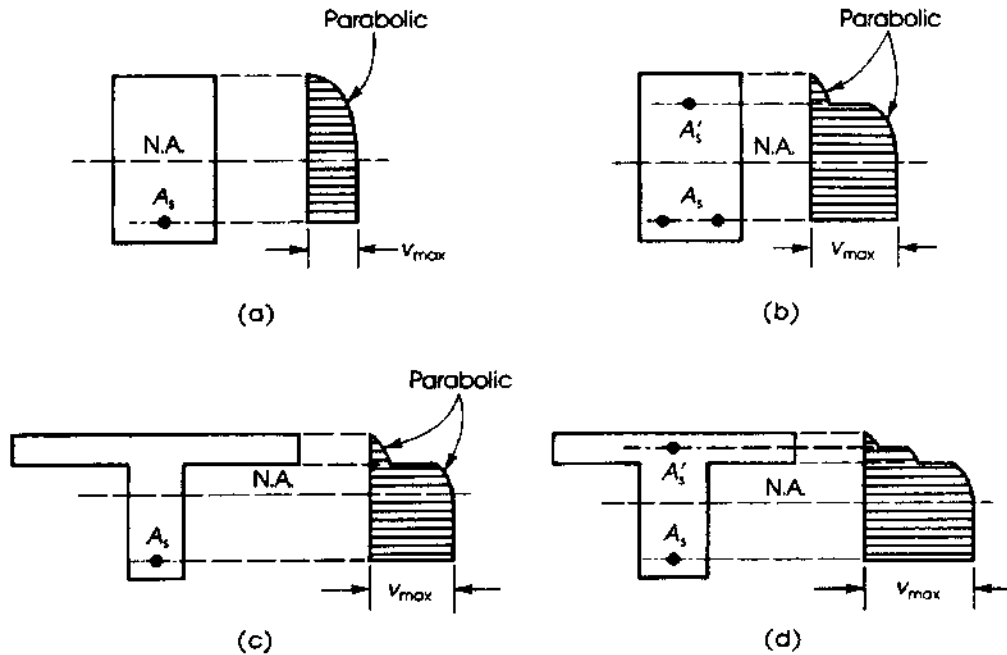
Distribution of shear stresses in reinforced concrete beams: (a) singly reinforced, (b) doubly reinforced, (c) T-section, (d) T-section with compression steel.
